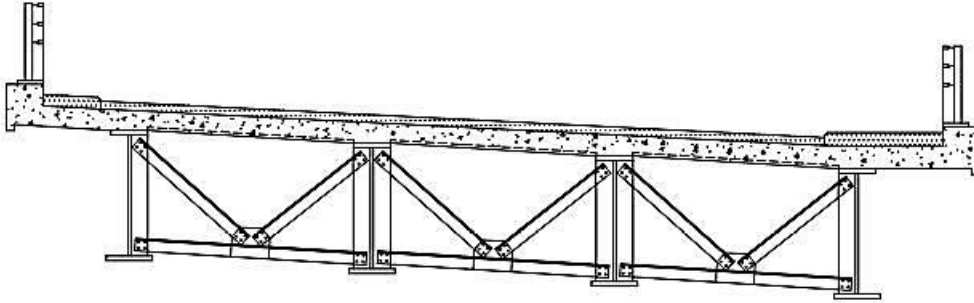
“V” type permanent bracing on abutment/intermediate support.
